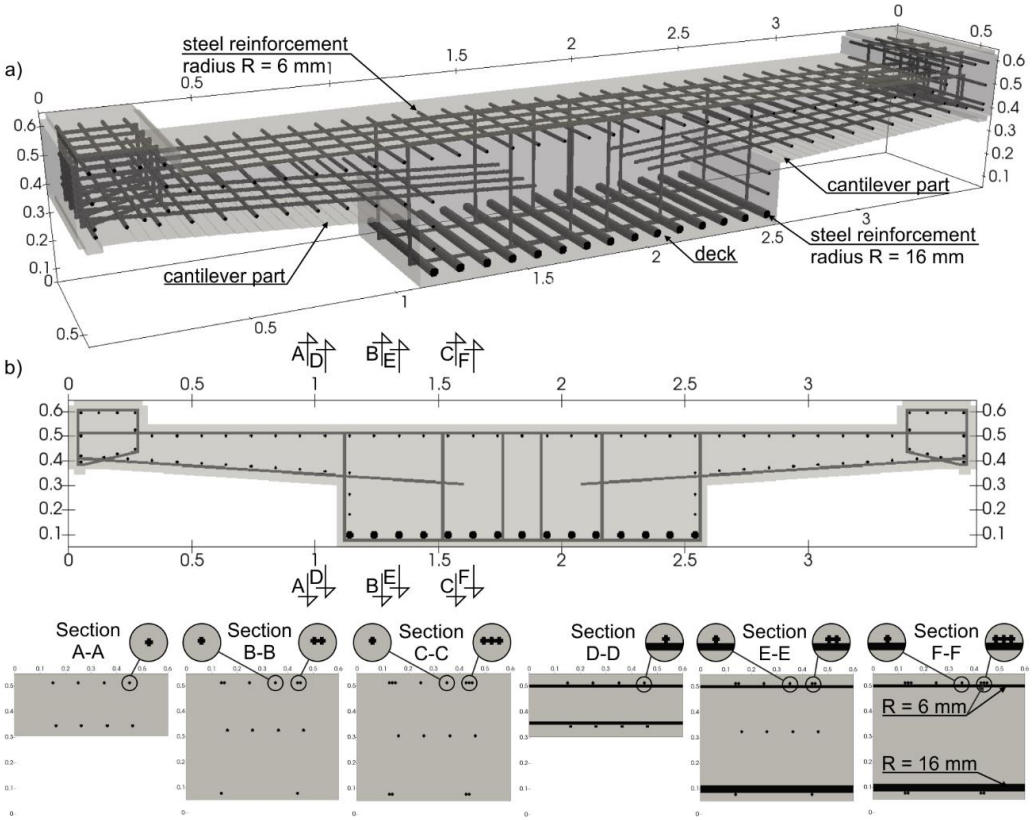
Numerical 3-D model of the considered bridge: (a) the system of the reinforcement; (b) 2-D view with marked sections A-A, B-B, C-C, D-D, E-E, F-F
